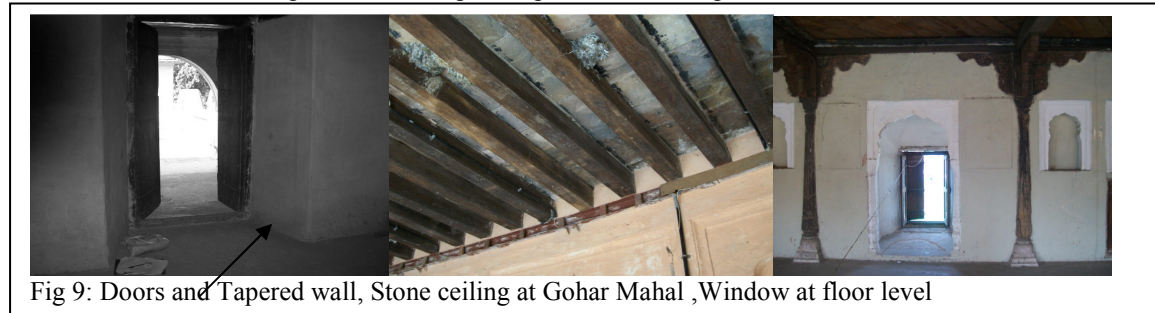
Doors and Tapered wall, Stone ceiling at Gohar Mahal ,Window at floor level
